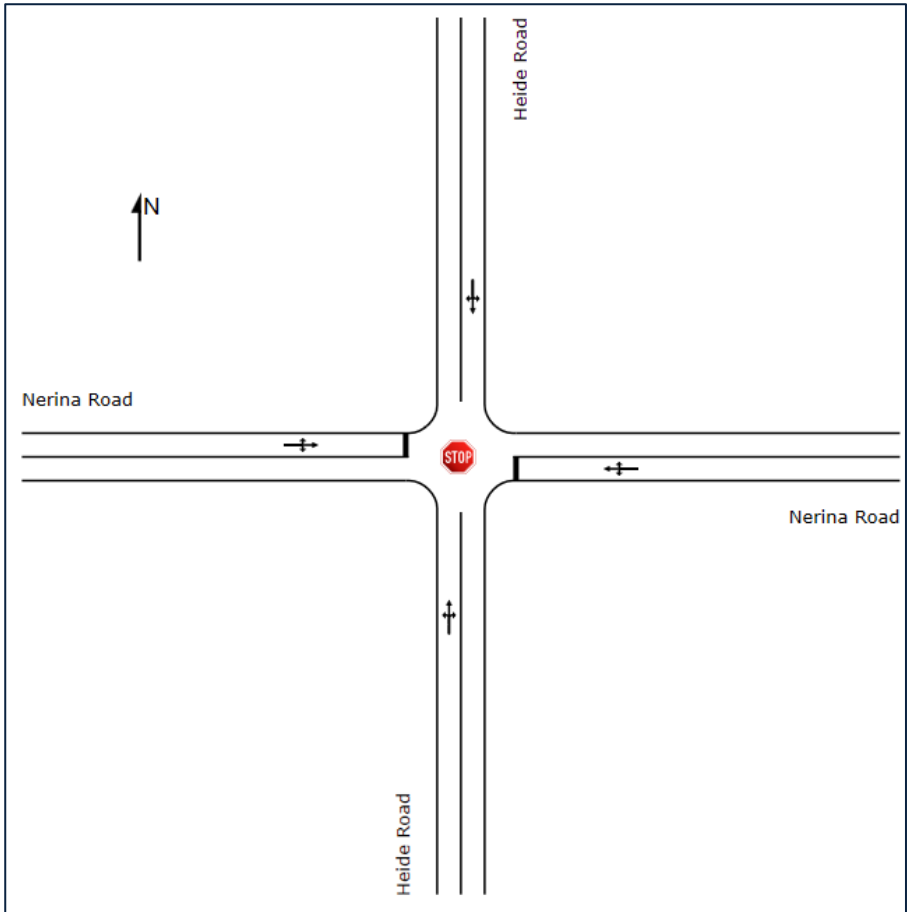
Proposed Intersection Layout: Heide Road and Nerina Road
